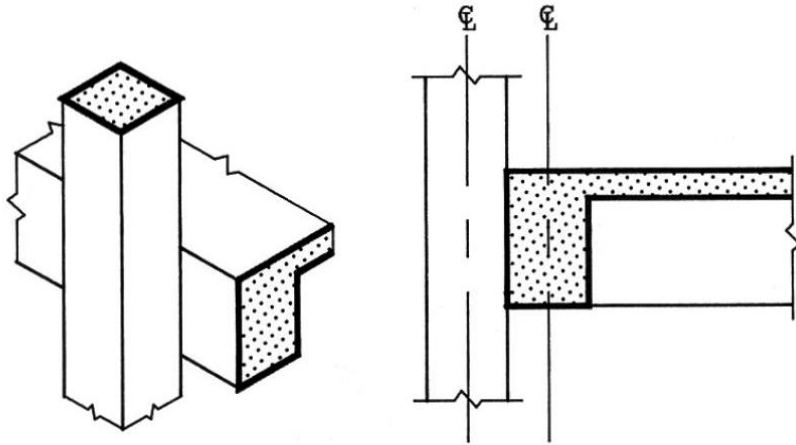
Eccentric load paths created by architectural detailing of structural connection
